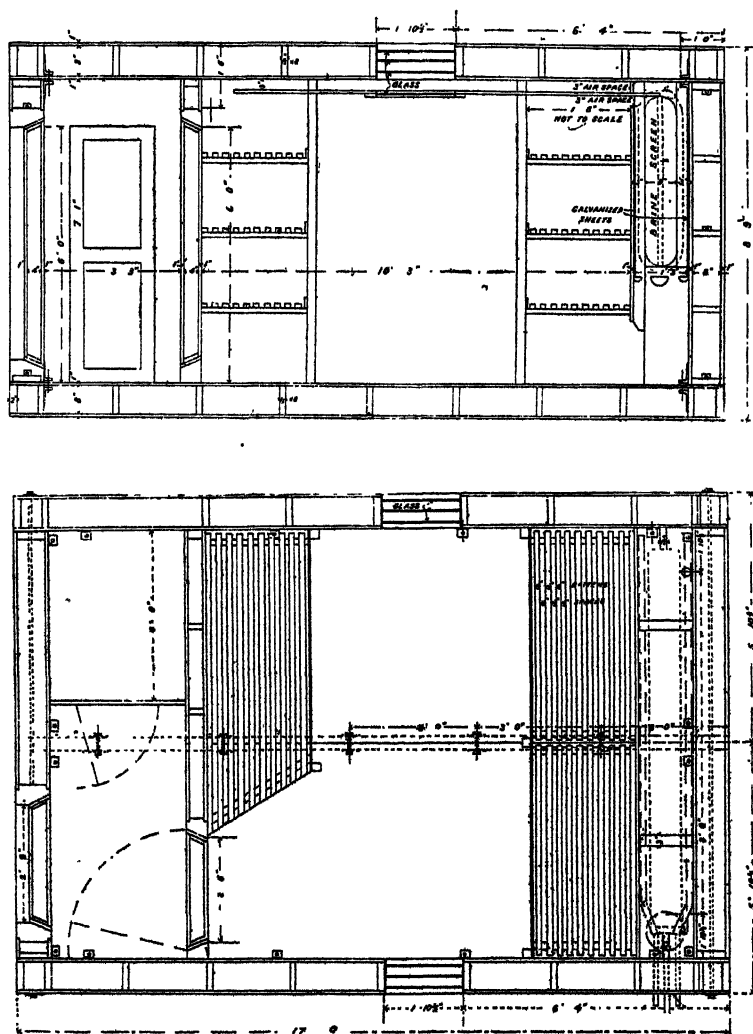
Sectional Elevation and Plan of Cold Chamber.
